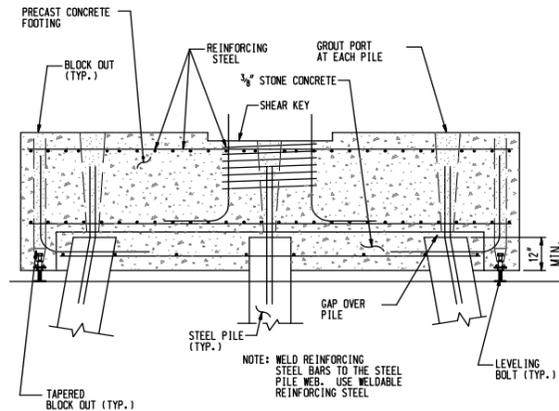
Connection between precast concrete footing and steel pile with uplift [8].
